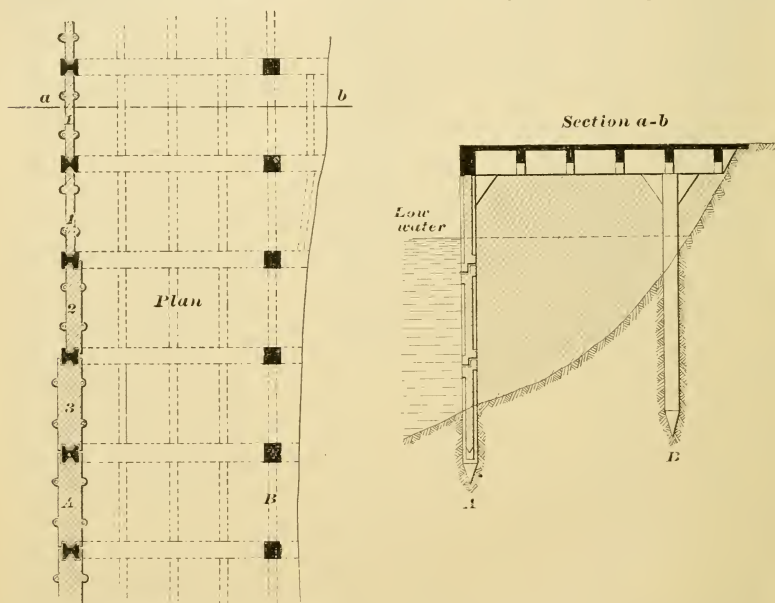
PROJECT OF WALL WITH PILES AND PANELS OF CEMENT ARMÉ.
